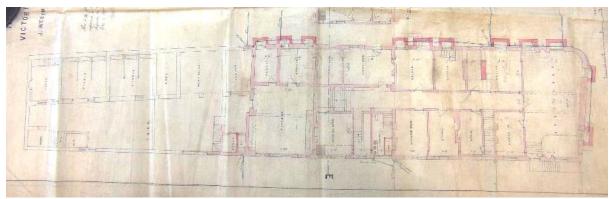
Original basement plan and yard 1879 (CA/E4/1195)
